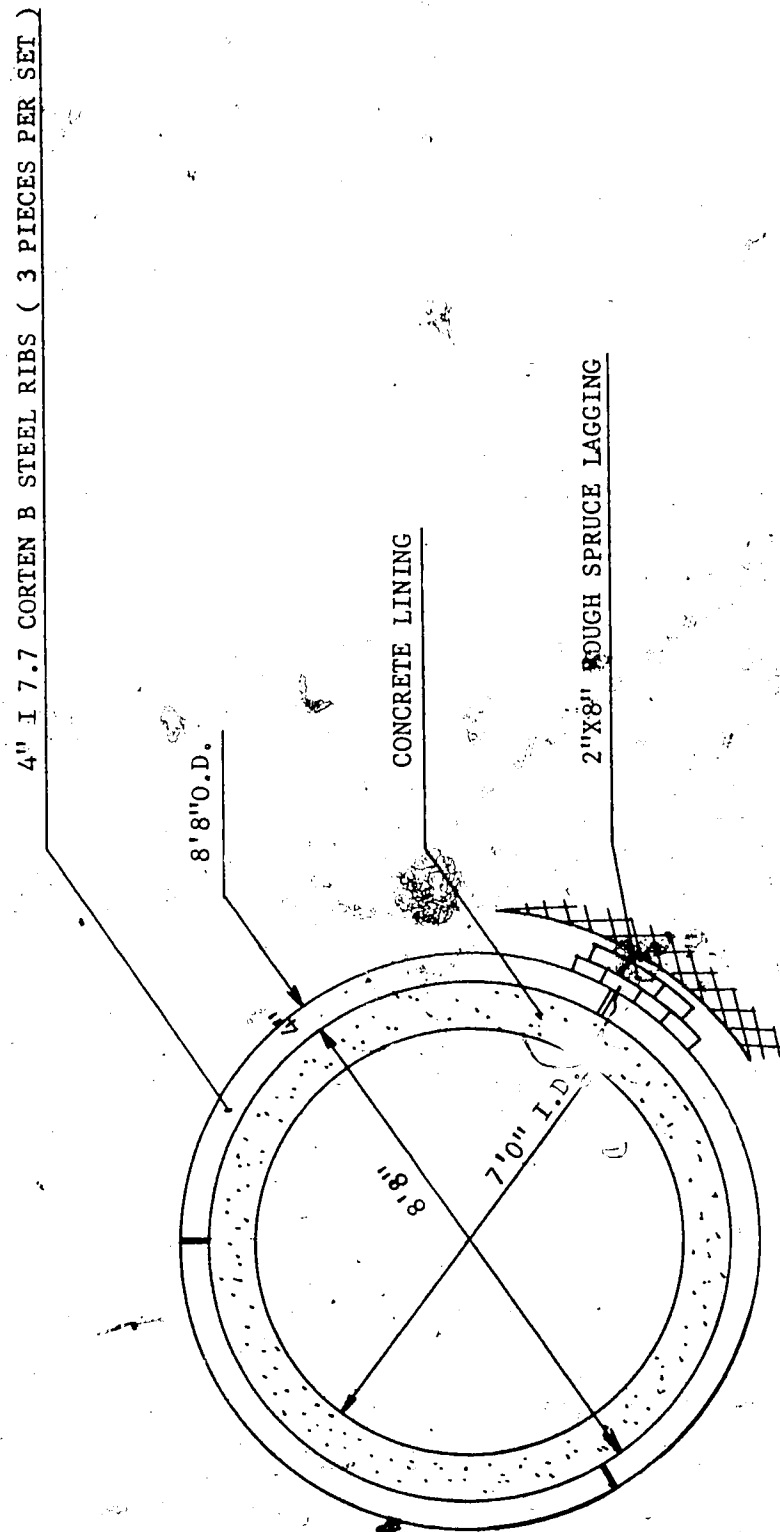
SECTION OF TUNNEL STUDIED IN DETAILS IN CHAPTER 7.
